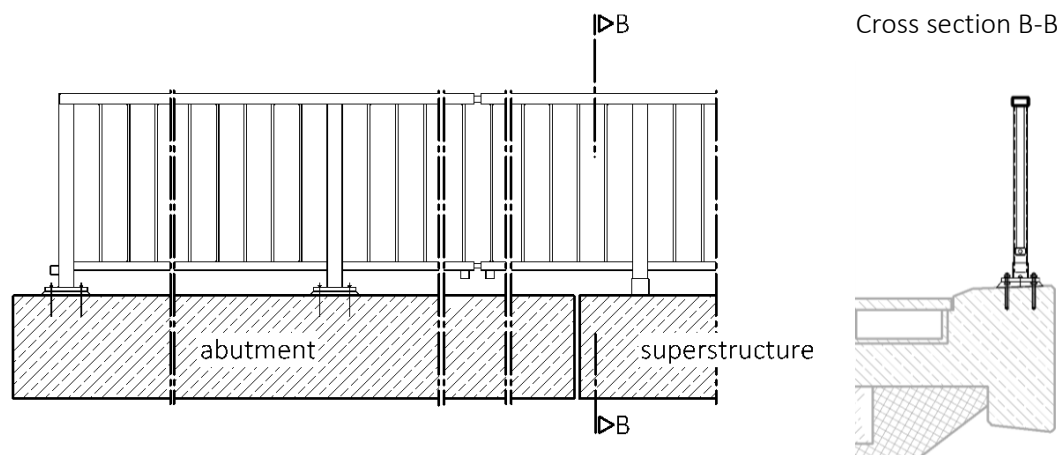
railing railway bridges according Ril 804 [U7] A-GEL-12
